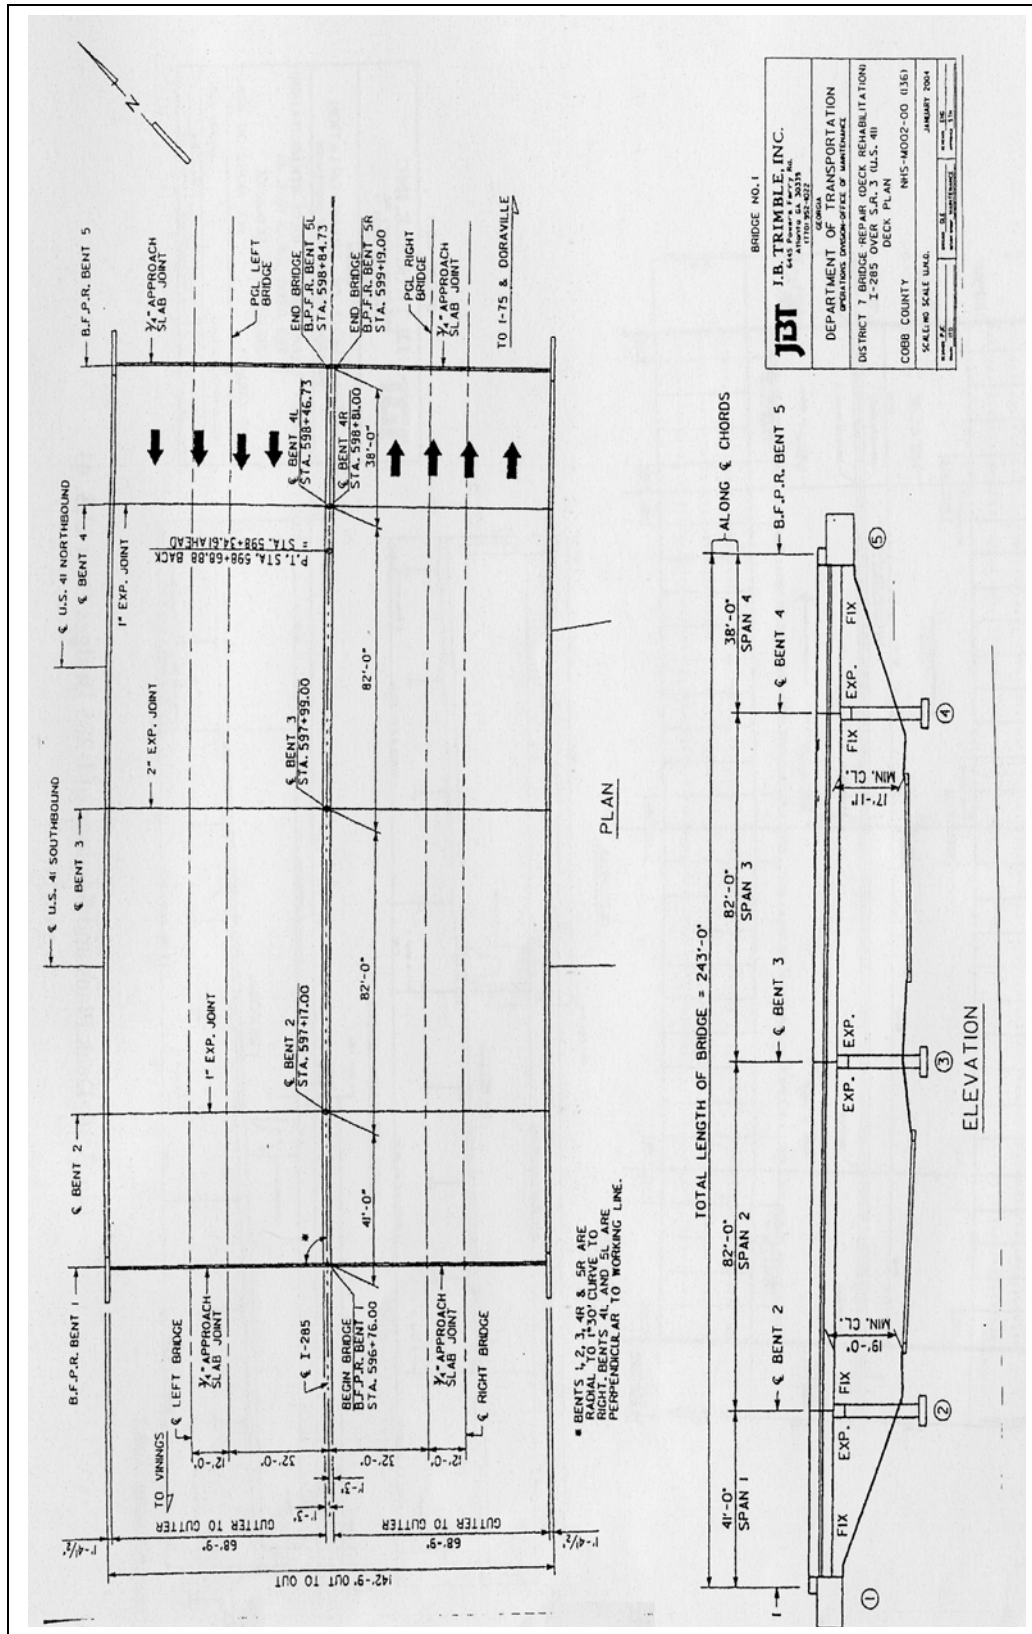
Plan and Elevation of I-285 Bridges Over U.S. 41 (2)
